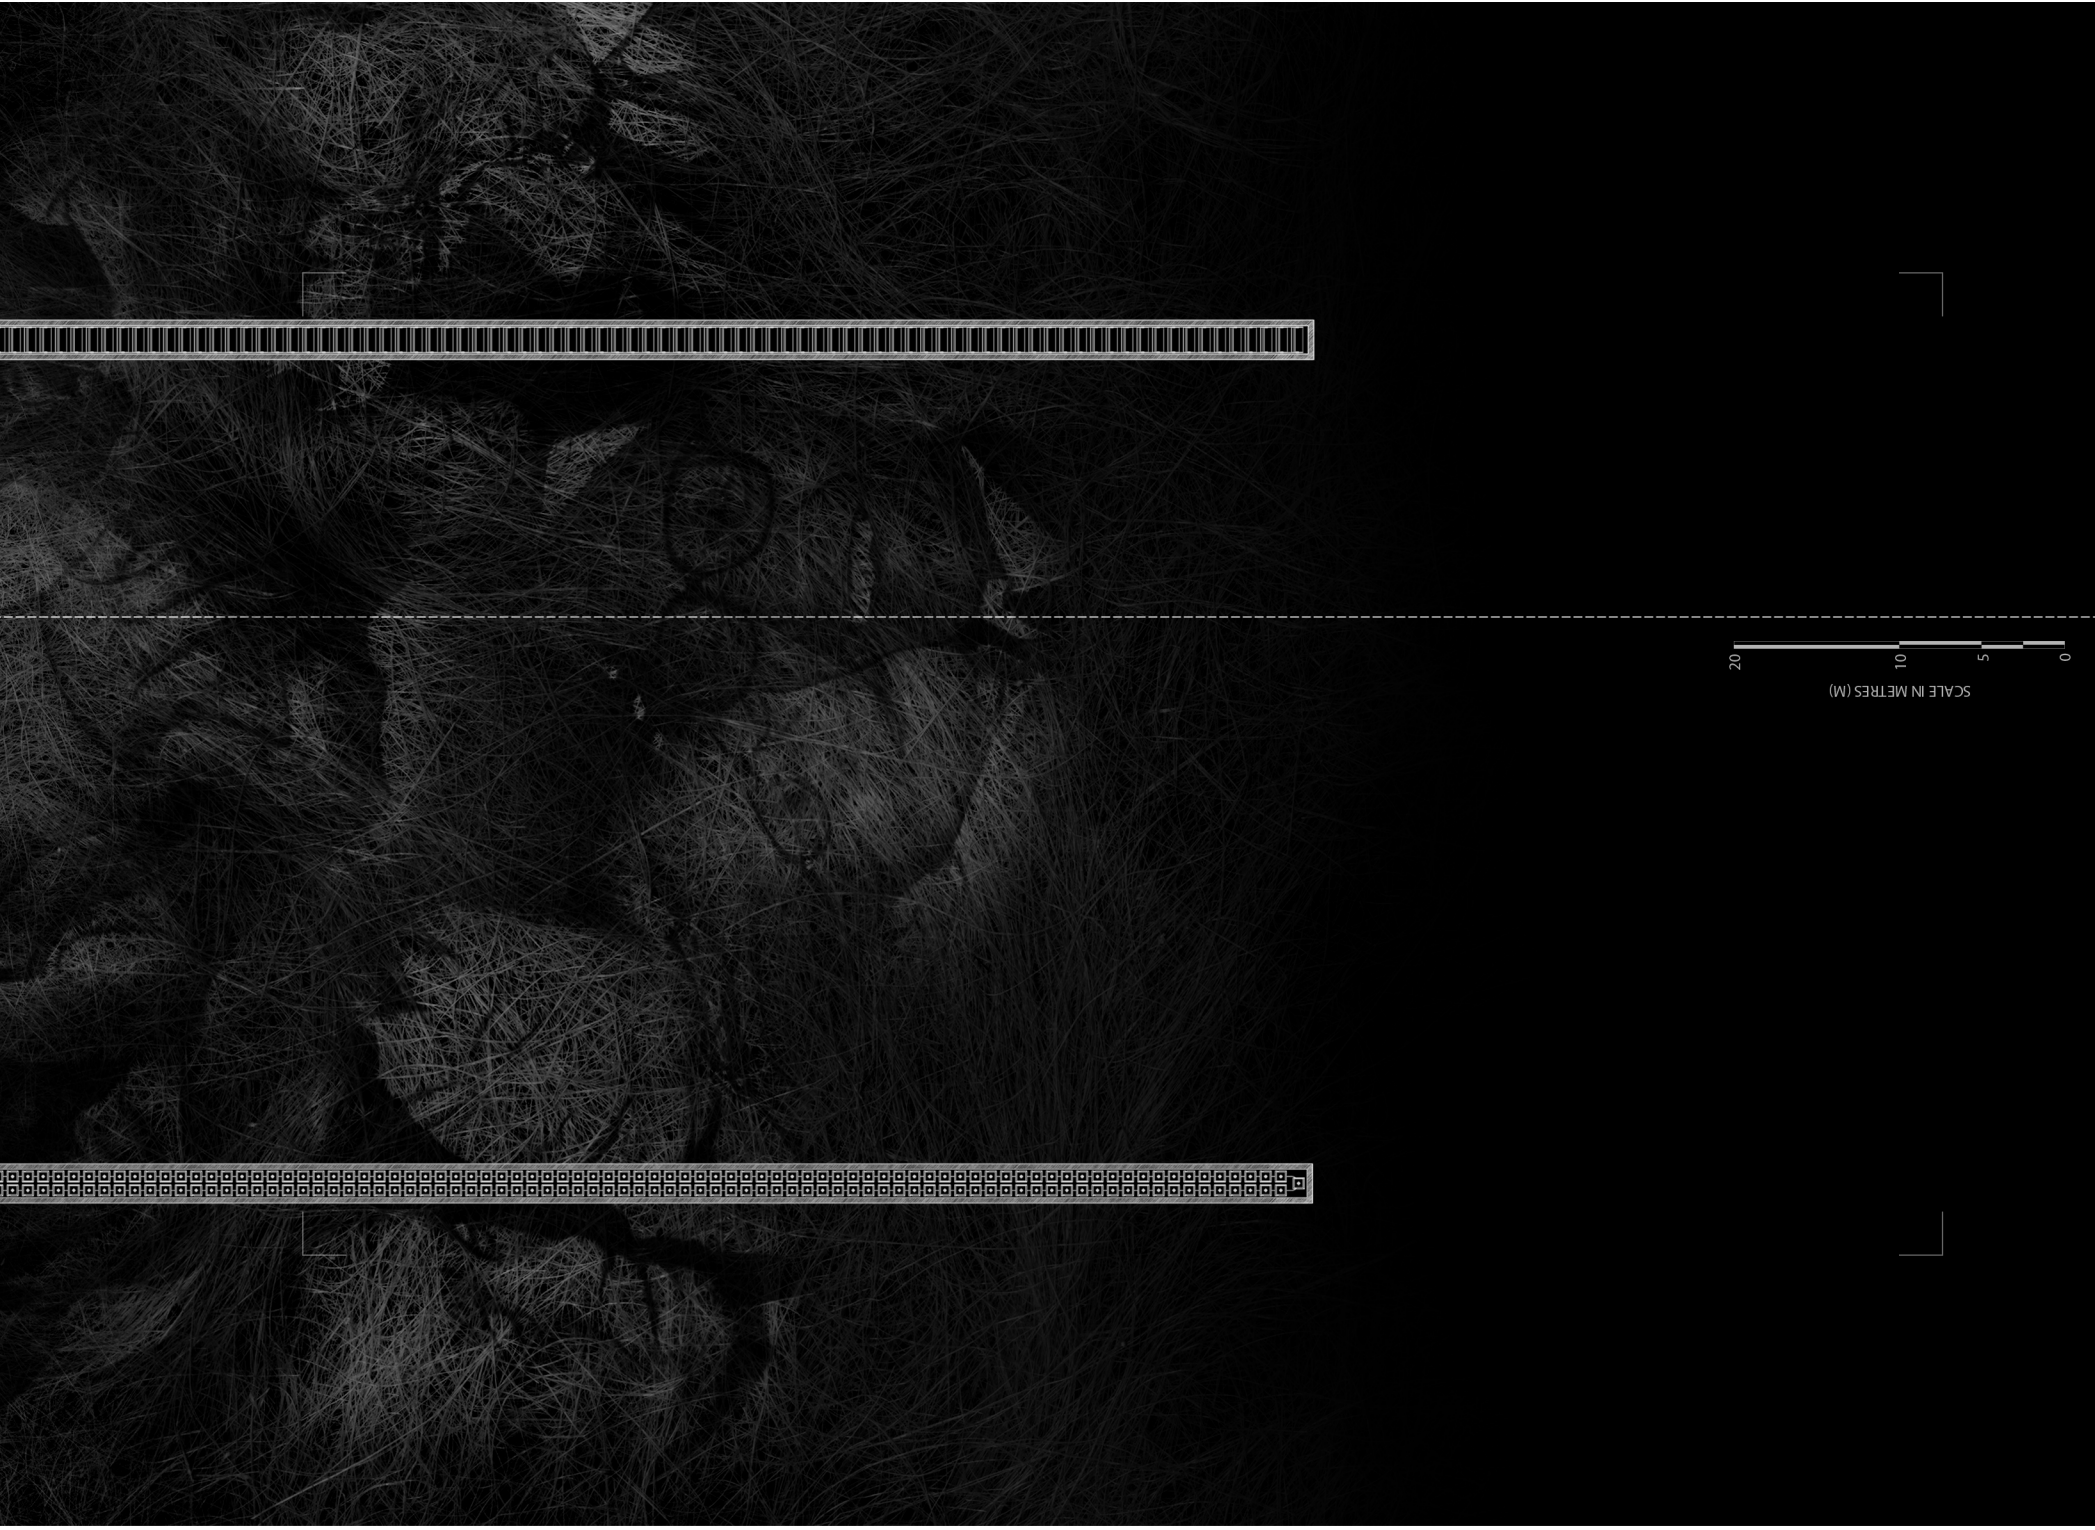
Yosop Ryoo. Section North - South & Section West - East of The Meeting-House in Panmunjeom (B&W); Scanned Image/Computer Illustration, 2010.
